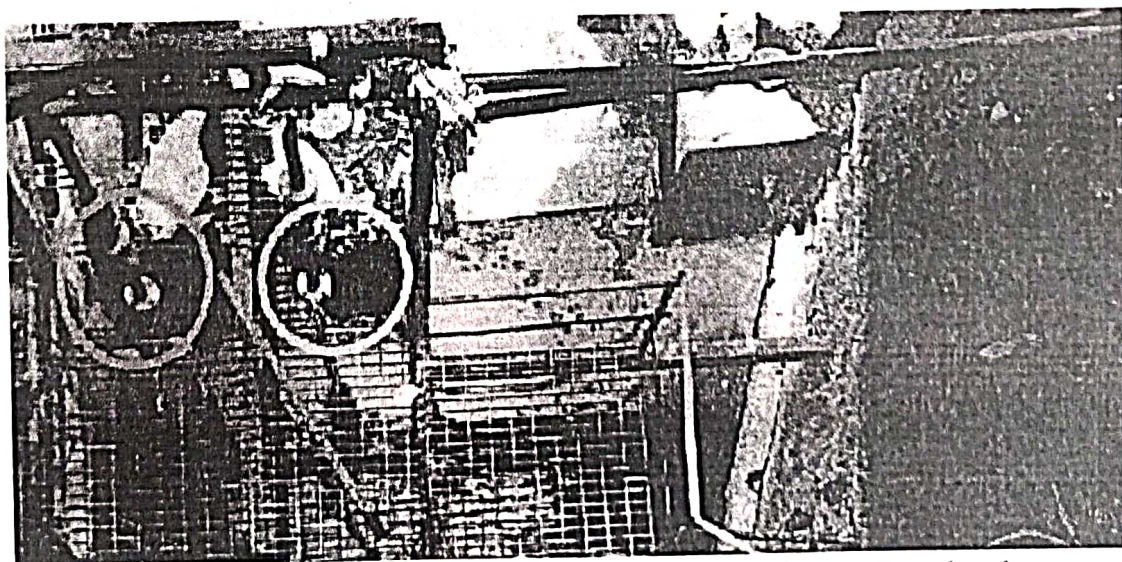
Onsite photograph Culvert catchment pit built by the Unit to gather the runoff water and the highlighted two water submissible pumps
